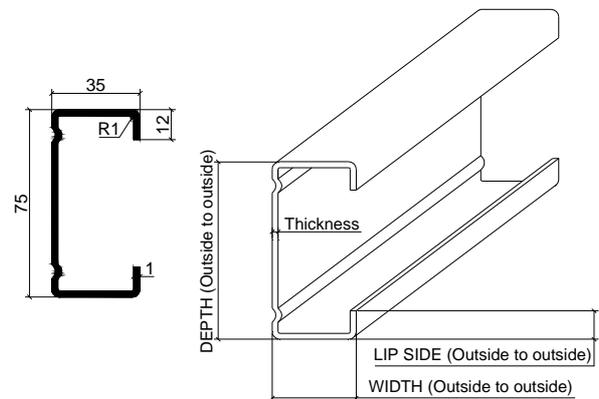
Section geometry and dimension of CFS section (unit: mm)
